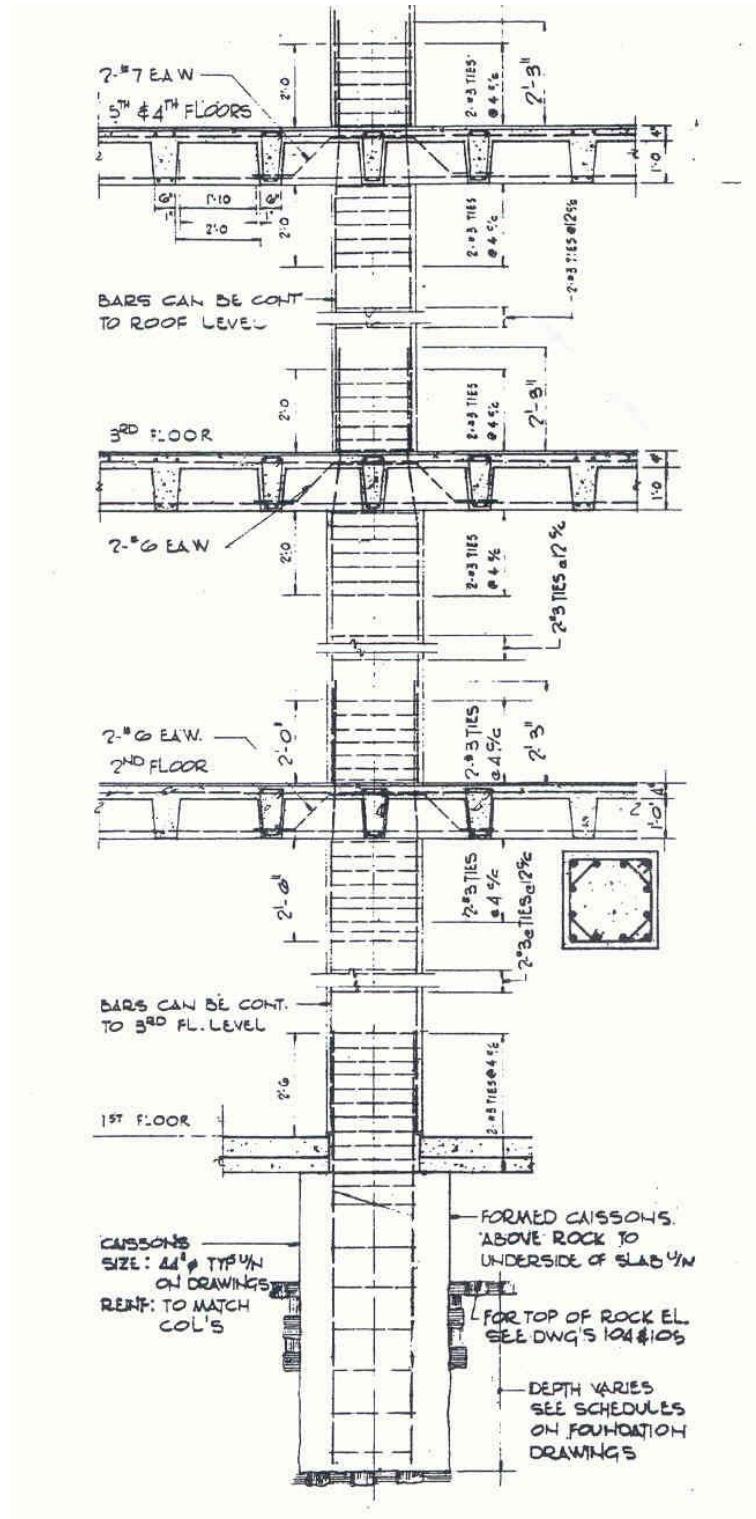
Typical Details of Column and Caisson, Sawyer Building Complex
